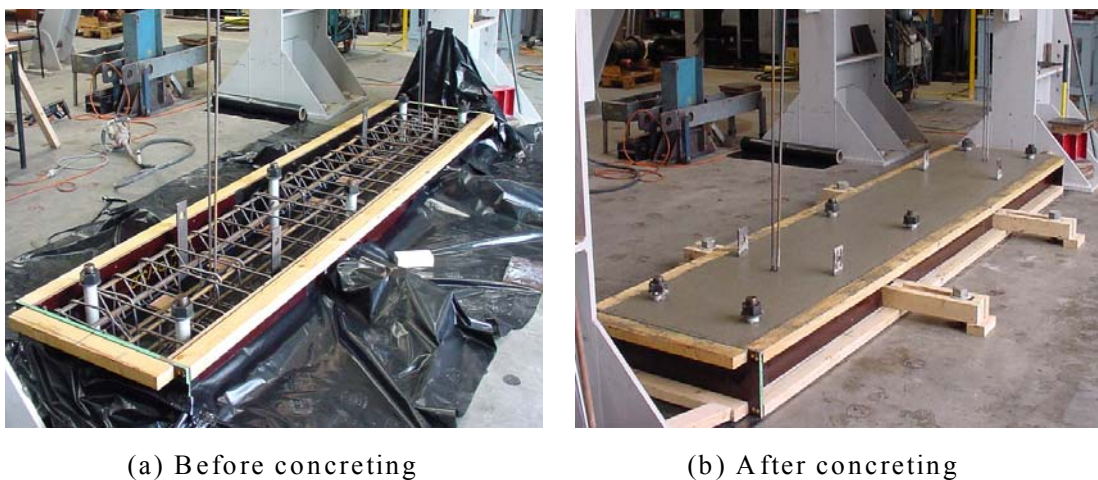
Construction of a base slab used for fixing the test wall to the strong floor
